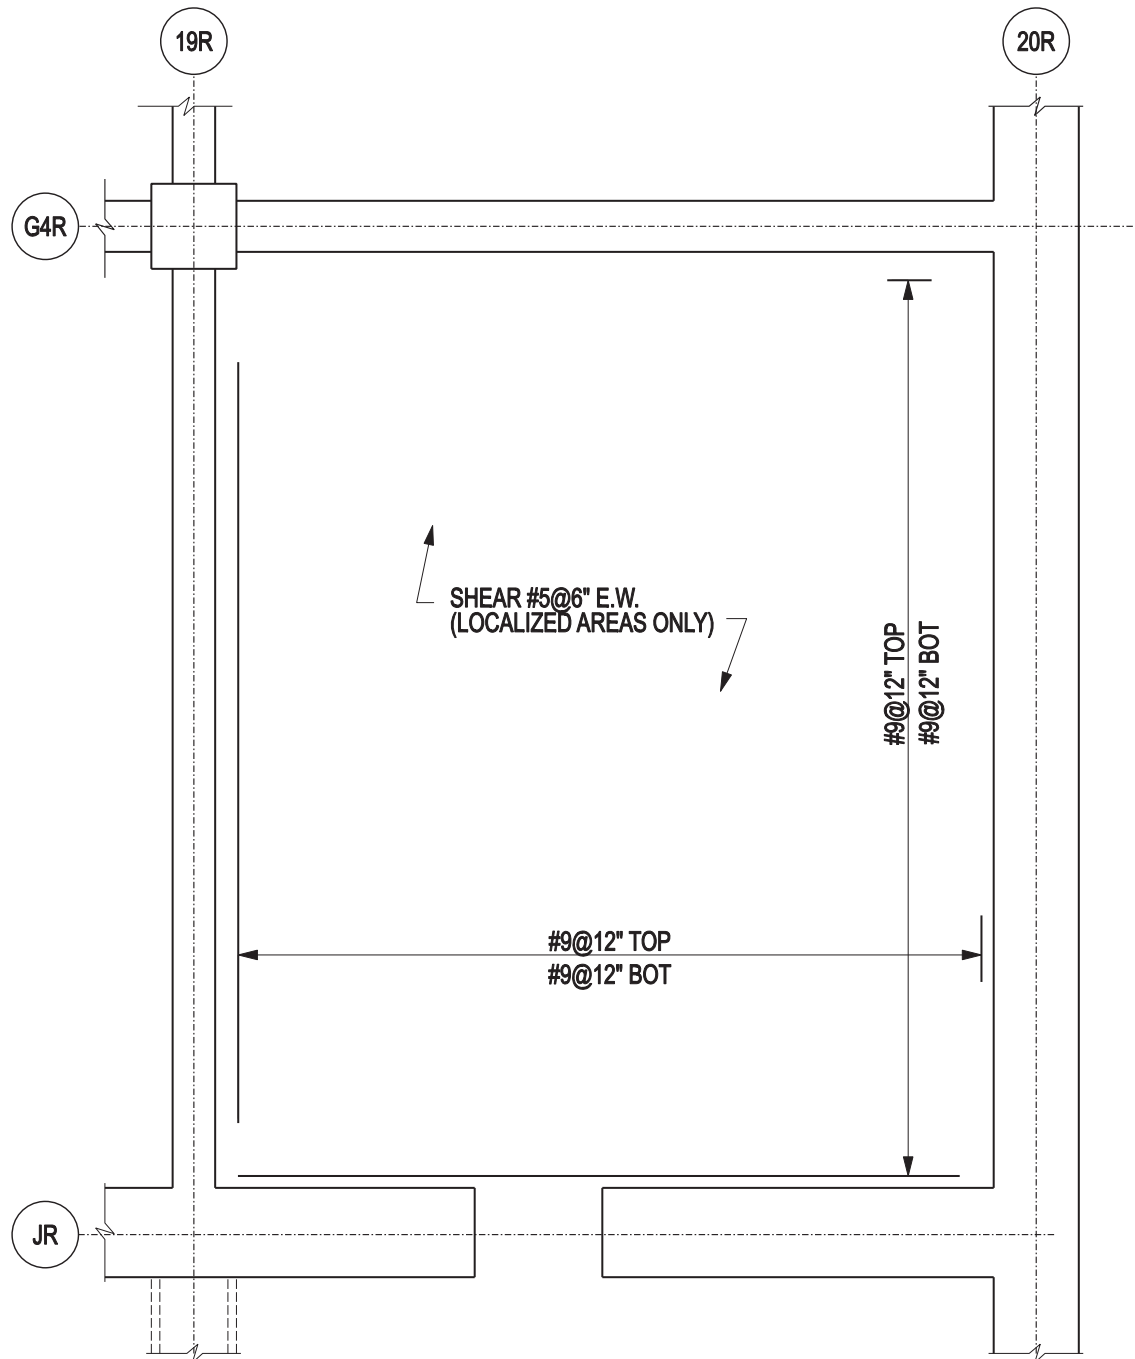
Typical Reinforcement in East PS/B Floor at Elevation 3'-7"-
